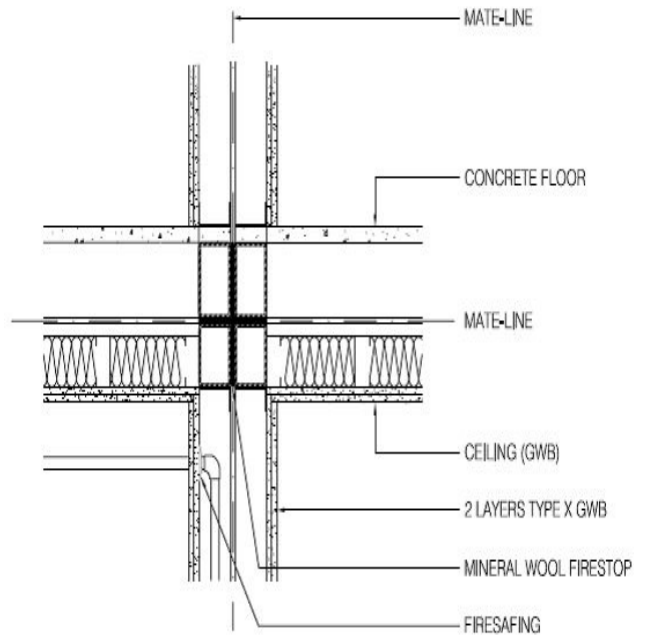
Internal connection plan view (Garrison and Tweedie 2008)
